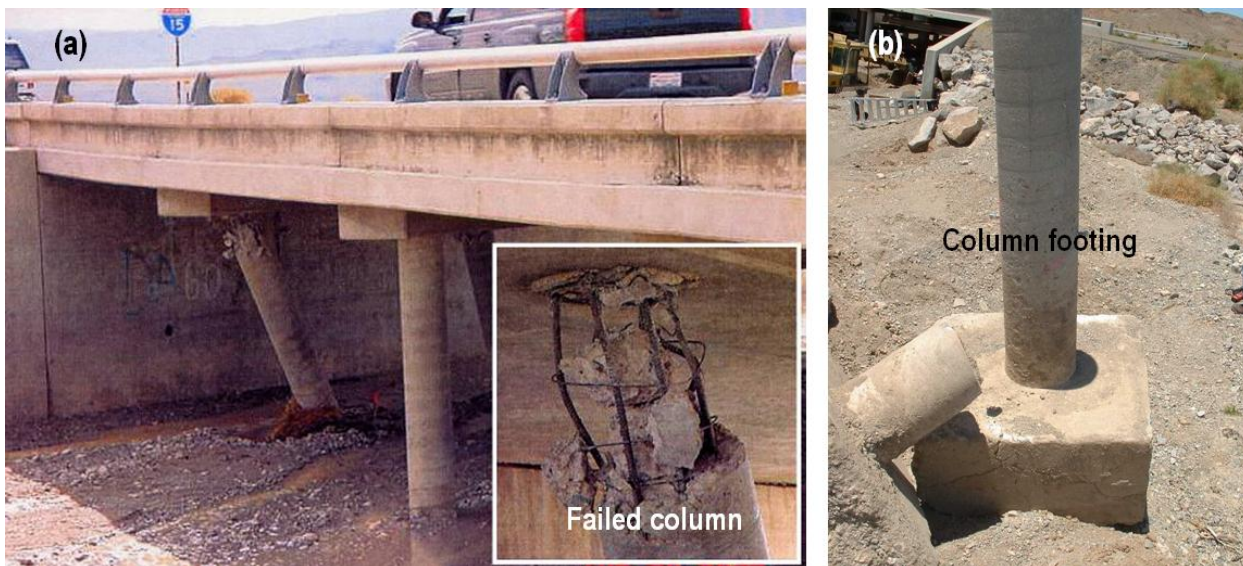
Oat Ditch Bridge on I-15 in California (a) failed column (b) column footing
